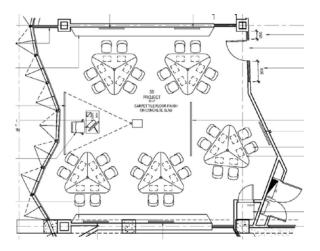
Plan of 30 capacity Project Room, RMIT Swanston Academic Building Architects: Lyons Architecture Source: Lyons Architects
